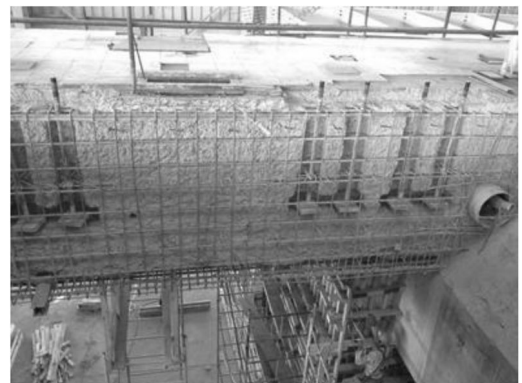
Beam after removing weak concrete. Notice the detailed area around anchorage.
